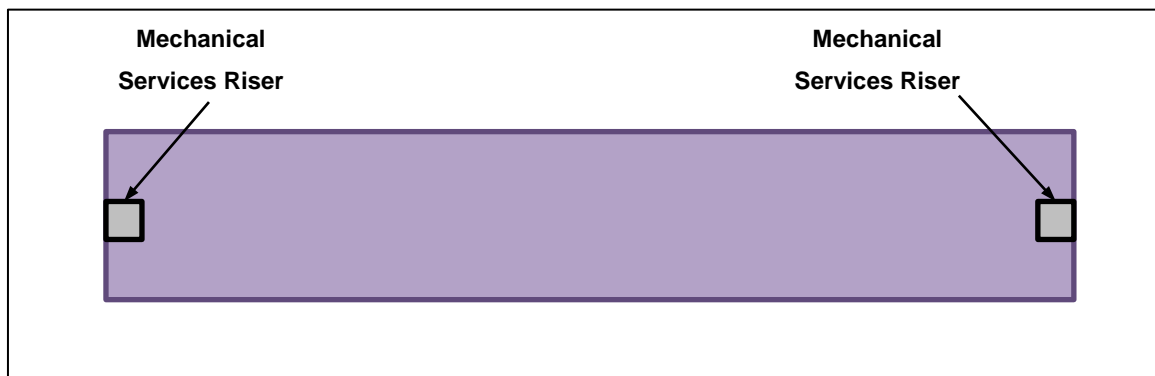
Smoke Exhaust Schematic – Original construction (plan)
